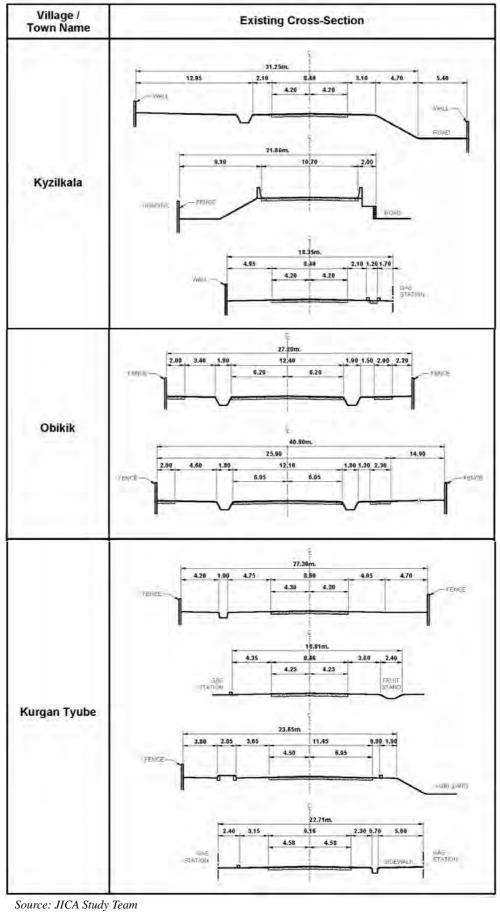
CROSS SECTION OF URBAN SECTION (2/2)
